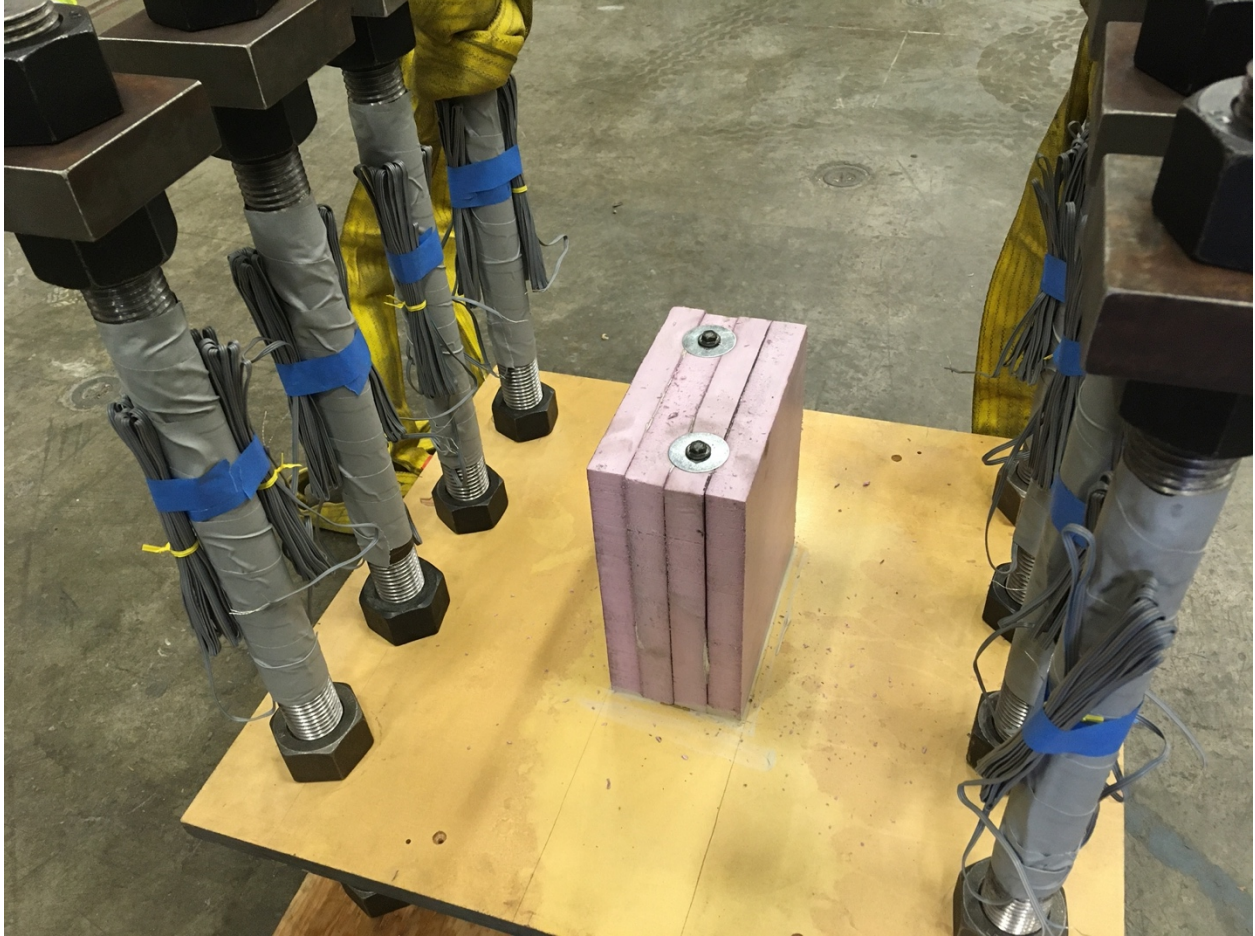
Anchor fixture showing foam mold for shear lug hole
